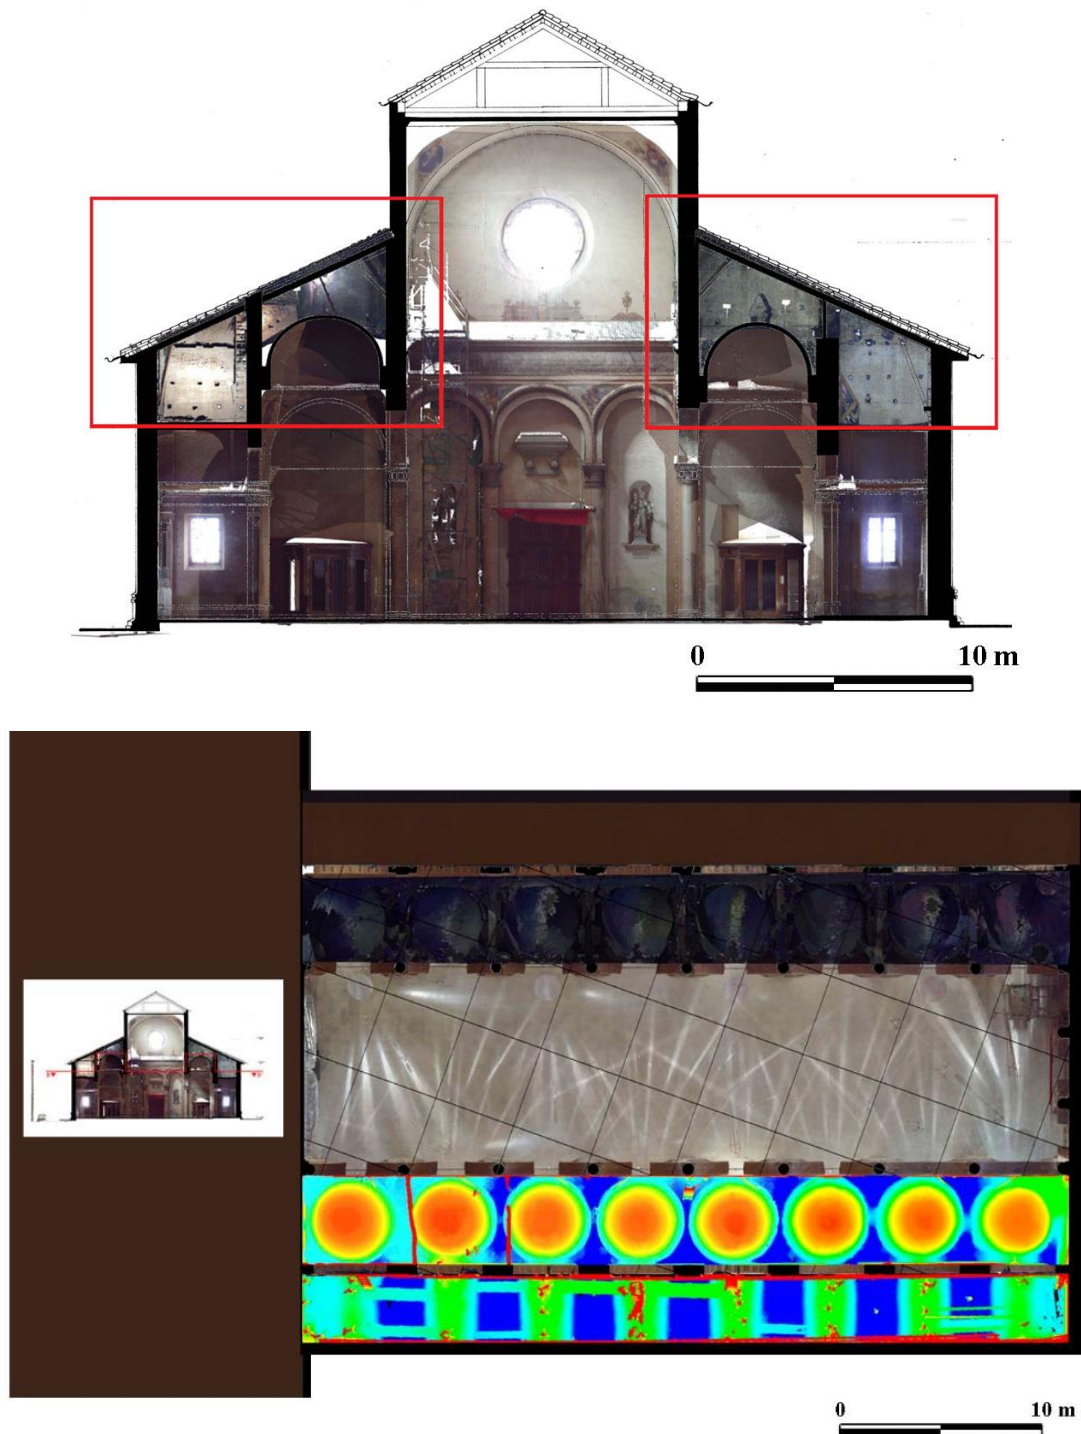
Cross (above) and horizontal (below) section of the aisles attic
